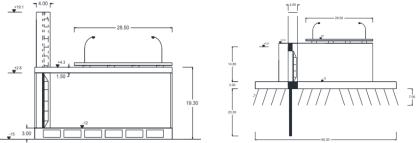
Cross - section of caisson sluice structure and pier structure with combined positive features
